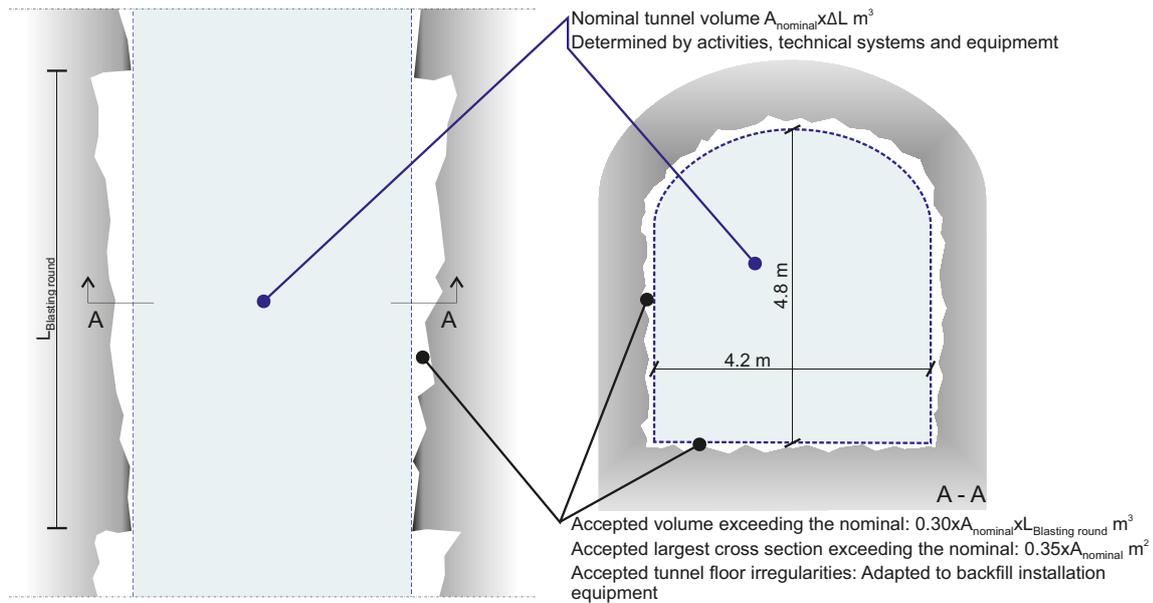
Nominal tunnel geometry and acceptable volume of rock fall out and irregularities in the tunnel walls.
